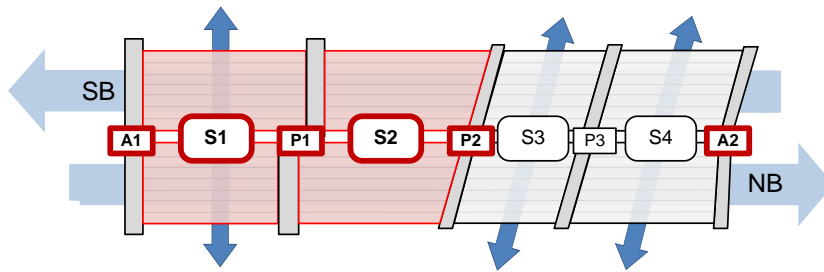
1 Structural components inspected by Korean Joint Team: span 1, span 2, abutment 1, abutment 2, pier 1, and pier 2 (Federal Highway Administration [FHWA], 2012)
